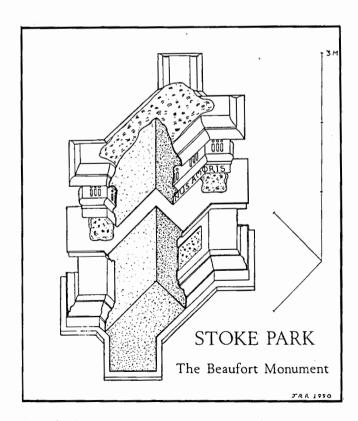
Cutaway axonometric drawing of the Beaufort Monument.
